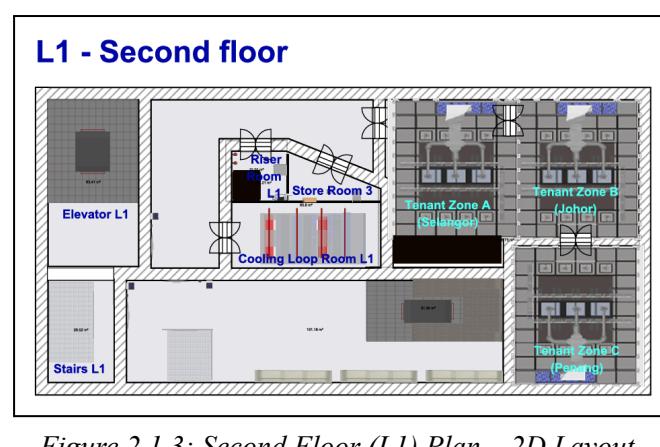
Second Floor (L1) Plan – 2D Layout
